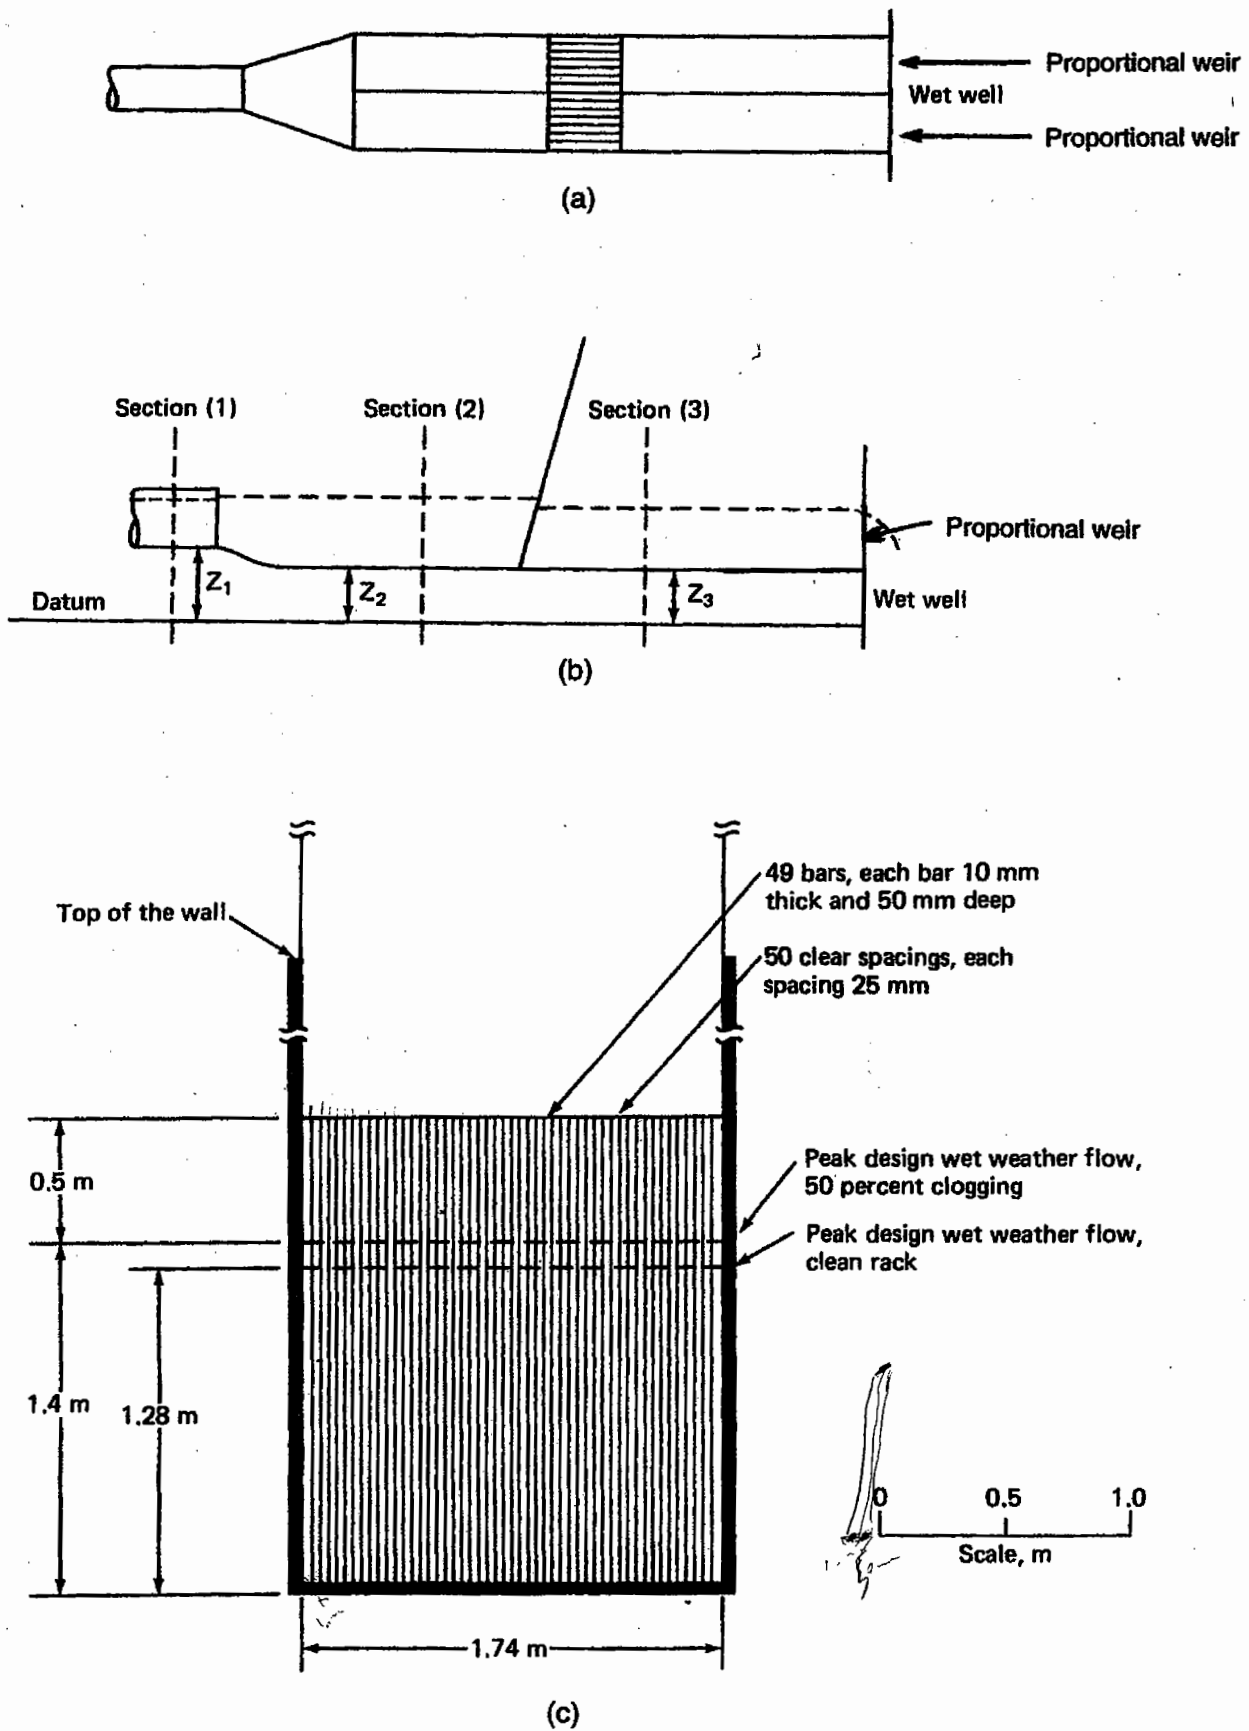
Details of Rack Chamber: (a) plan; (b) longitudinal section through the rack chamber; and (c) cross section showing bar arrangement, channel section, and depths of flow.
